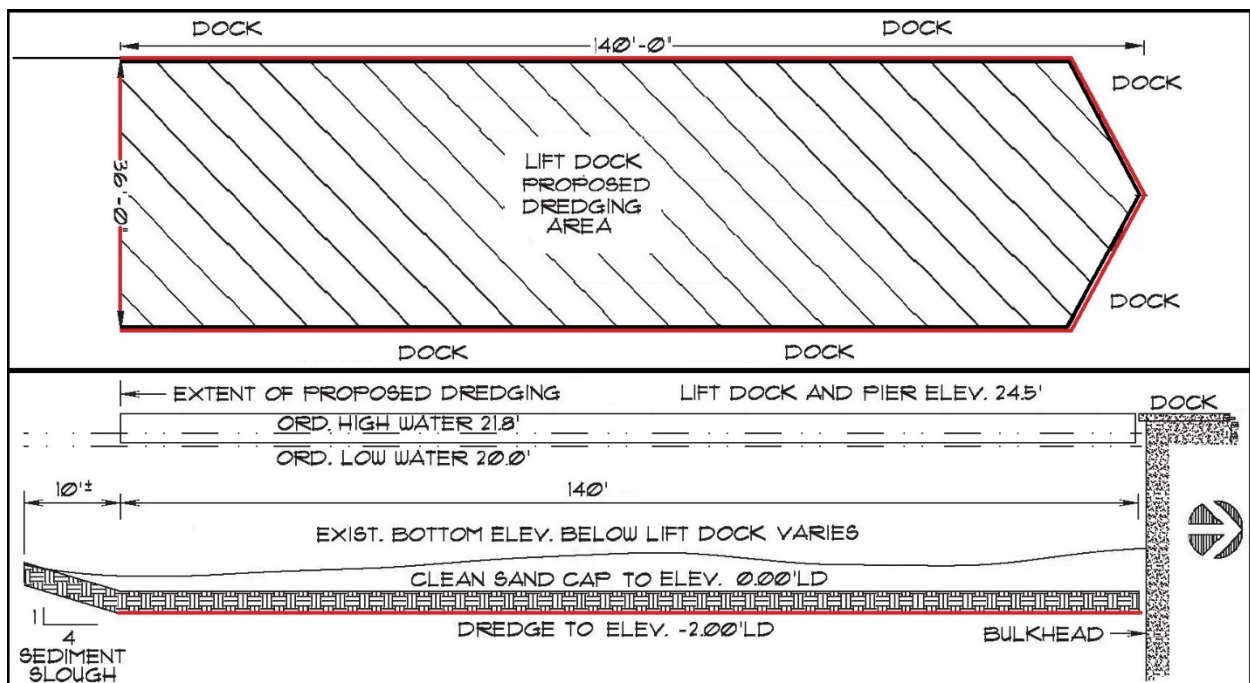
The proposed dredging area and elevations under Pacific Fishermen Shipyard's Dry Dock #3 in the Lake Washington Ship Canal, Seattle Washington.
